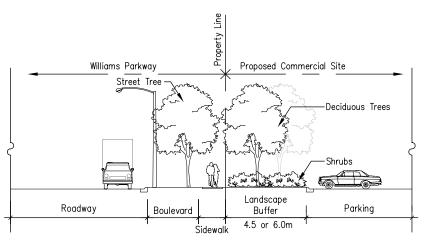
Buffer Type A1: Parking along street - Typical section
